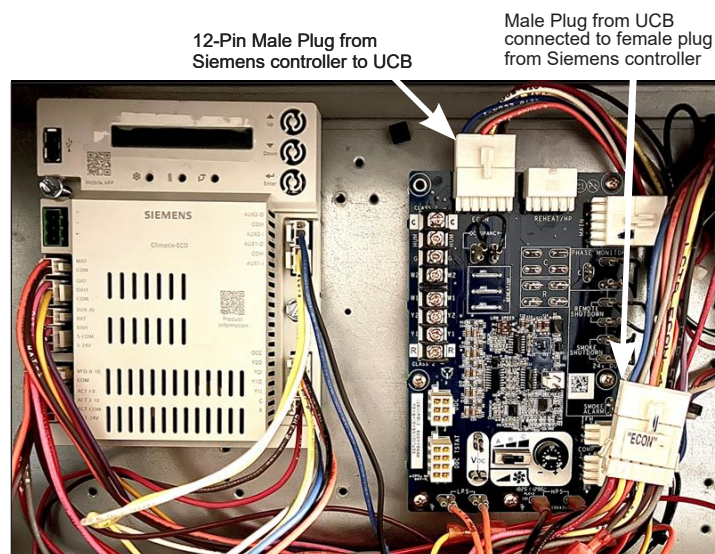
Mount Controller Assembly in Unit Control Box next to Units with a UCB
